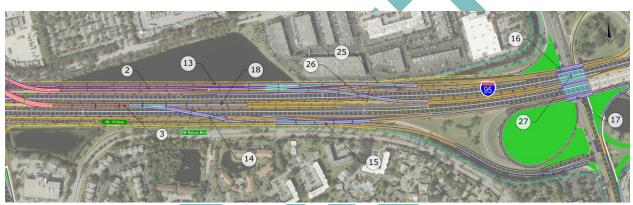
9: Proposed Bridge Locations (2 of 3)
